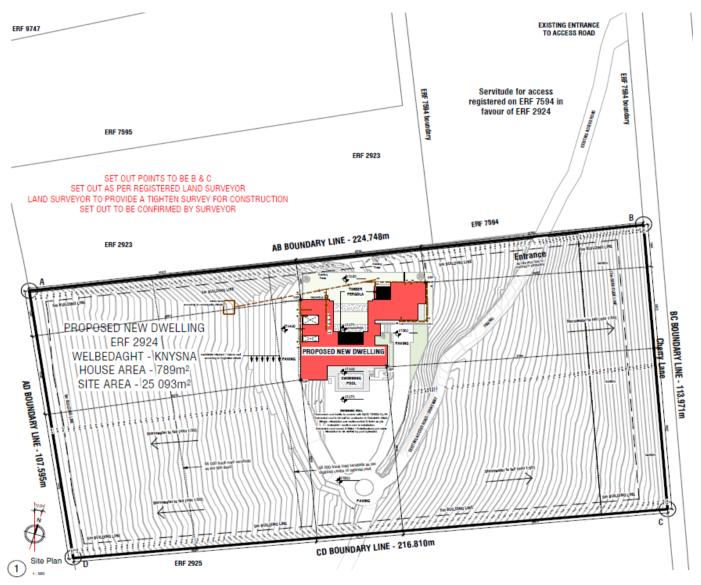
Revised site development plan with access road (Mathews + associate architects, 2024)
